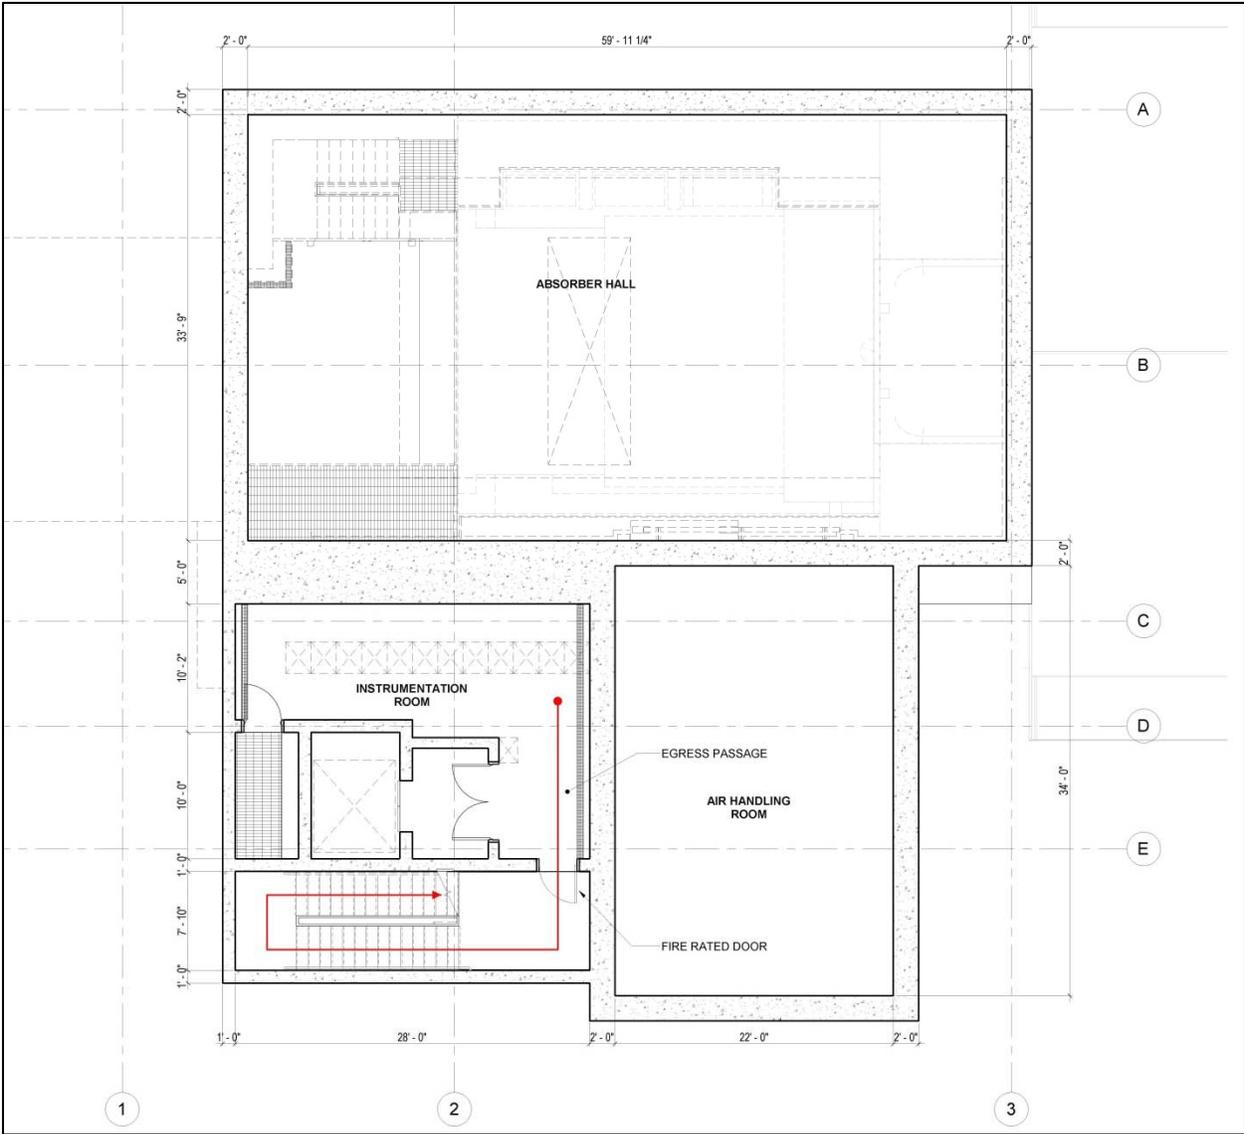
Absorber Hall, Instrumentation Room: Upper Level, Egress Routing
